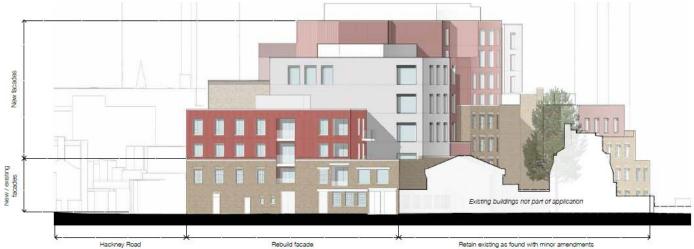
Proposed Strout's Place Building Elevation (residential block)
